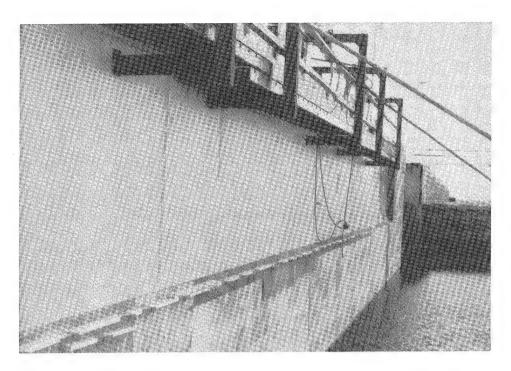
Precast panels and forms along bottom of panels in place and ready for placement of backfill grout, Lock 22
